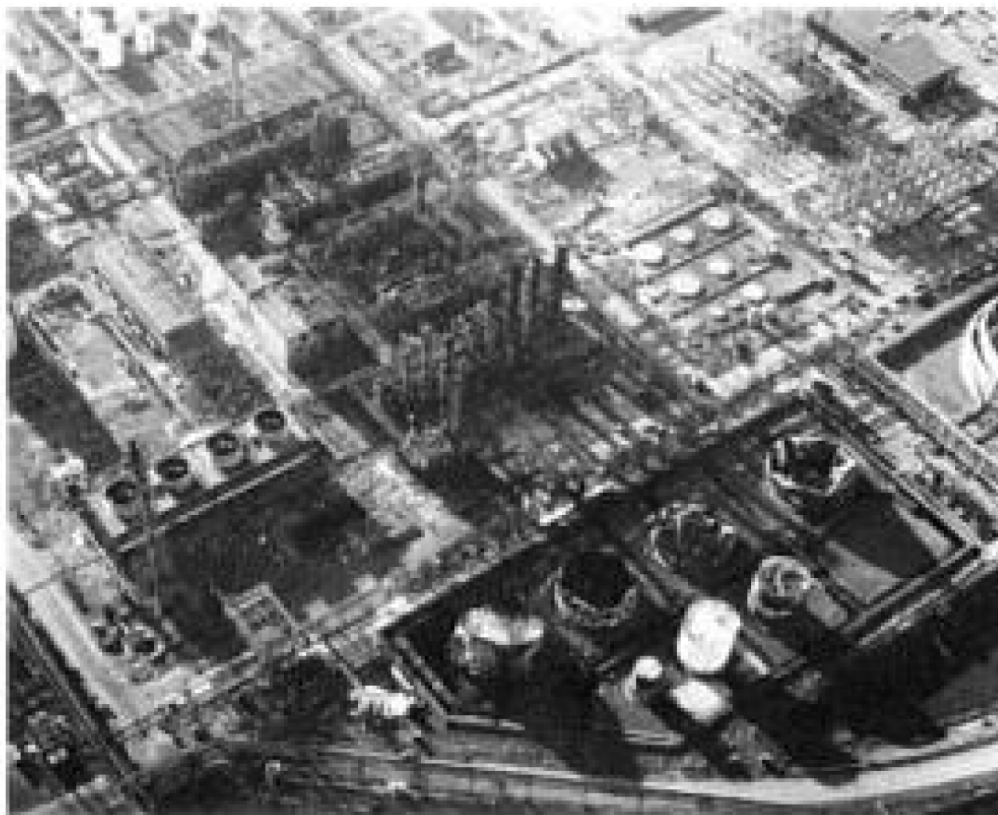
Damaged plant. Note the tank damage Reproduced with permission from [30]).
